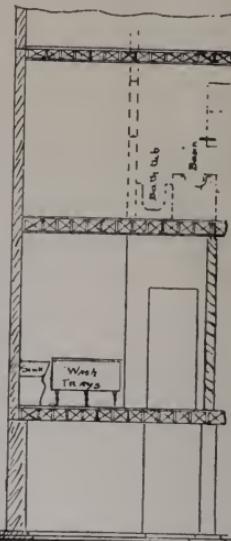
A CROSS SECTION OF HOUSE SHOWING BRIDGING.
